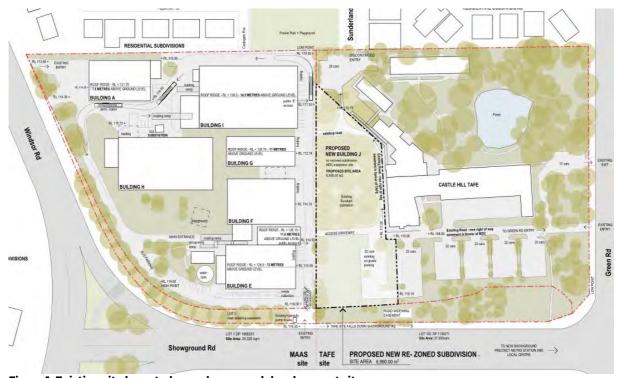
Existing site layout plan and proposed development site Source: Lahznimmo Architects
